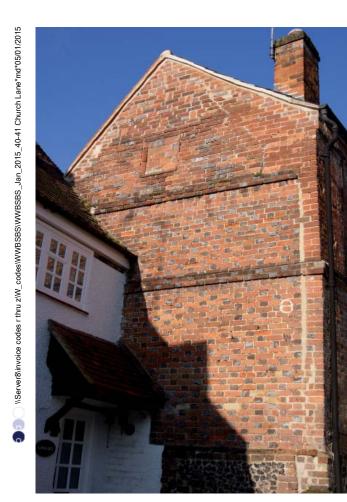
South elevation showing phasing in brickwork (after conservation work)
